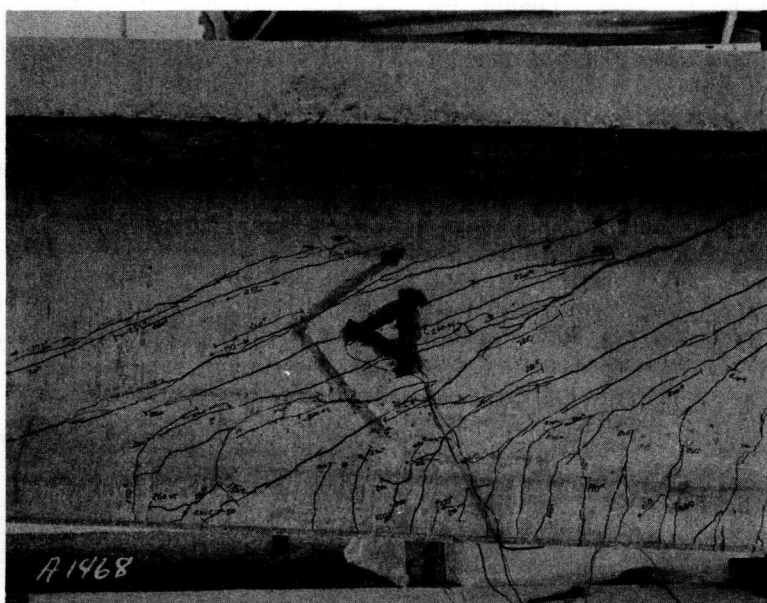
Cracking pattern, composite shear test, pretensioned beam.
